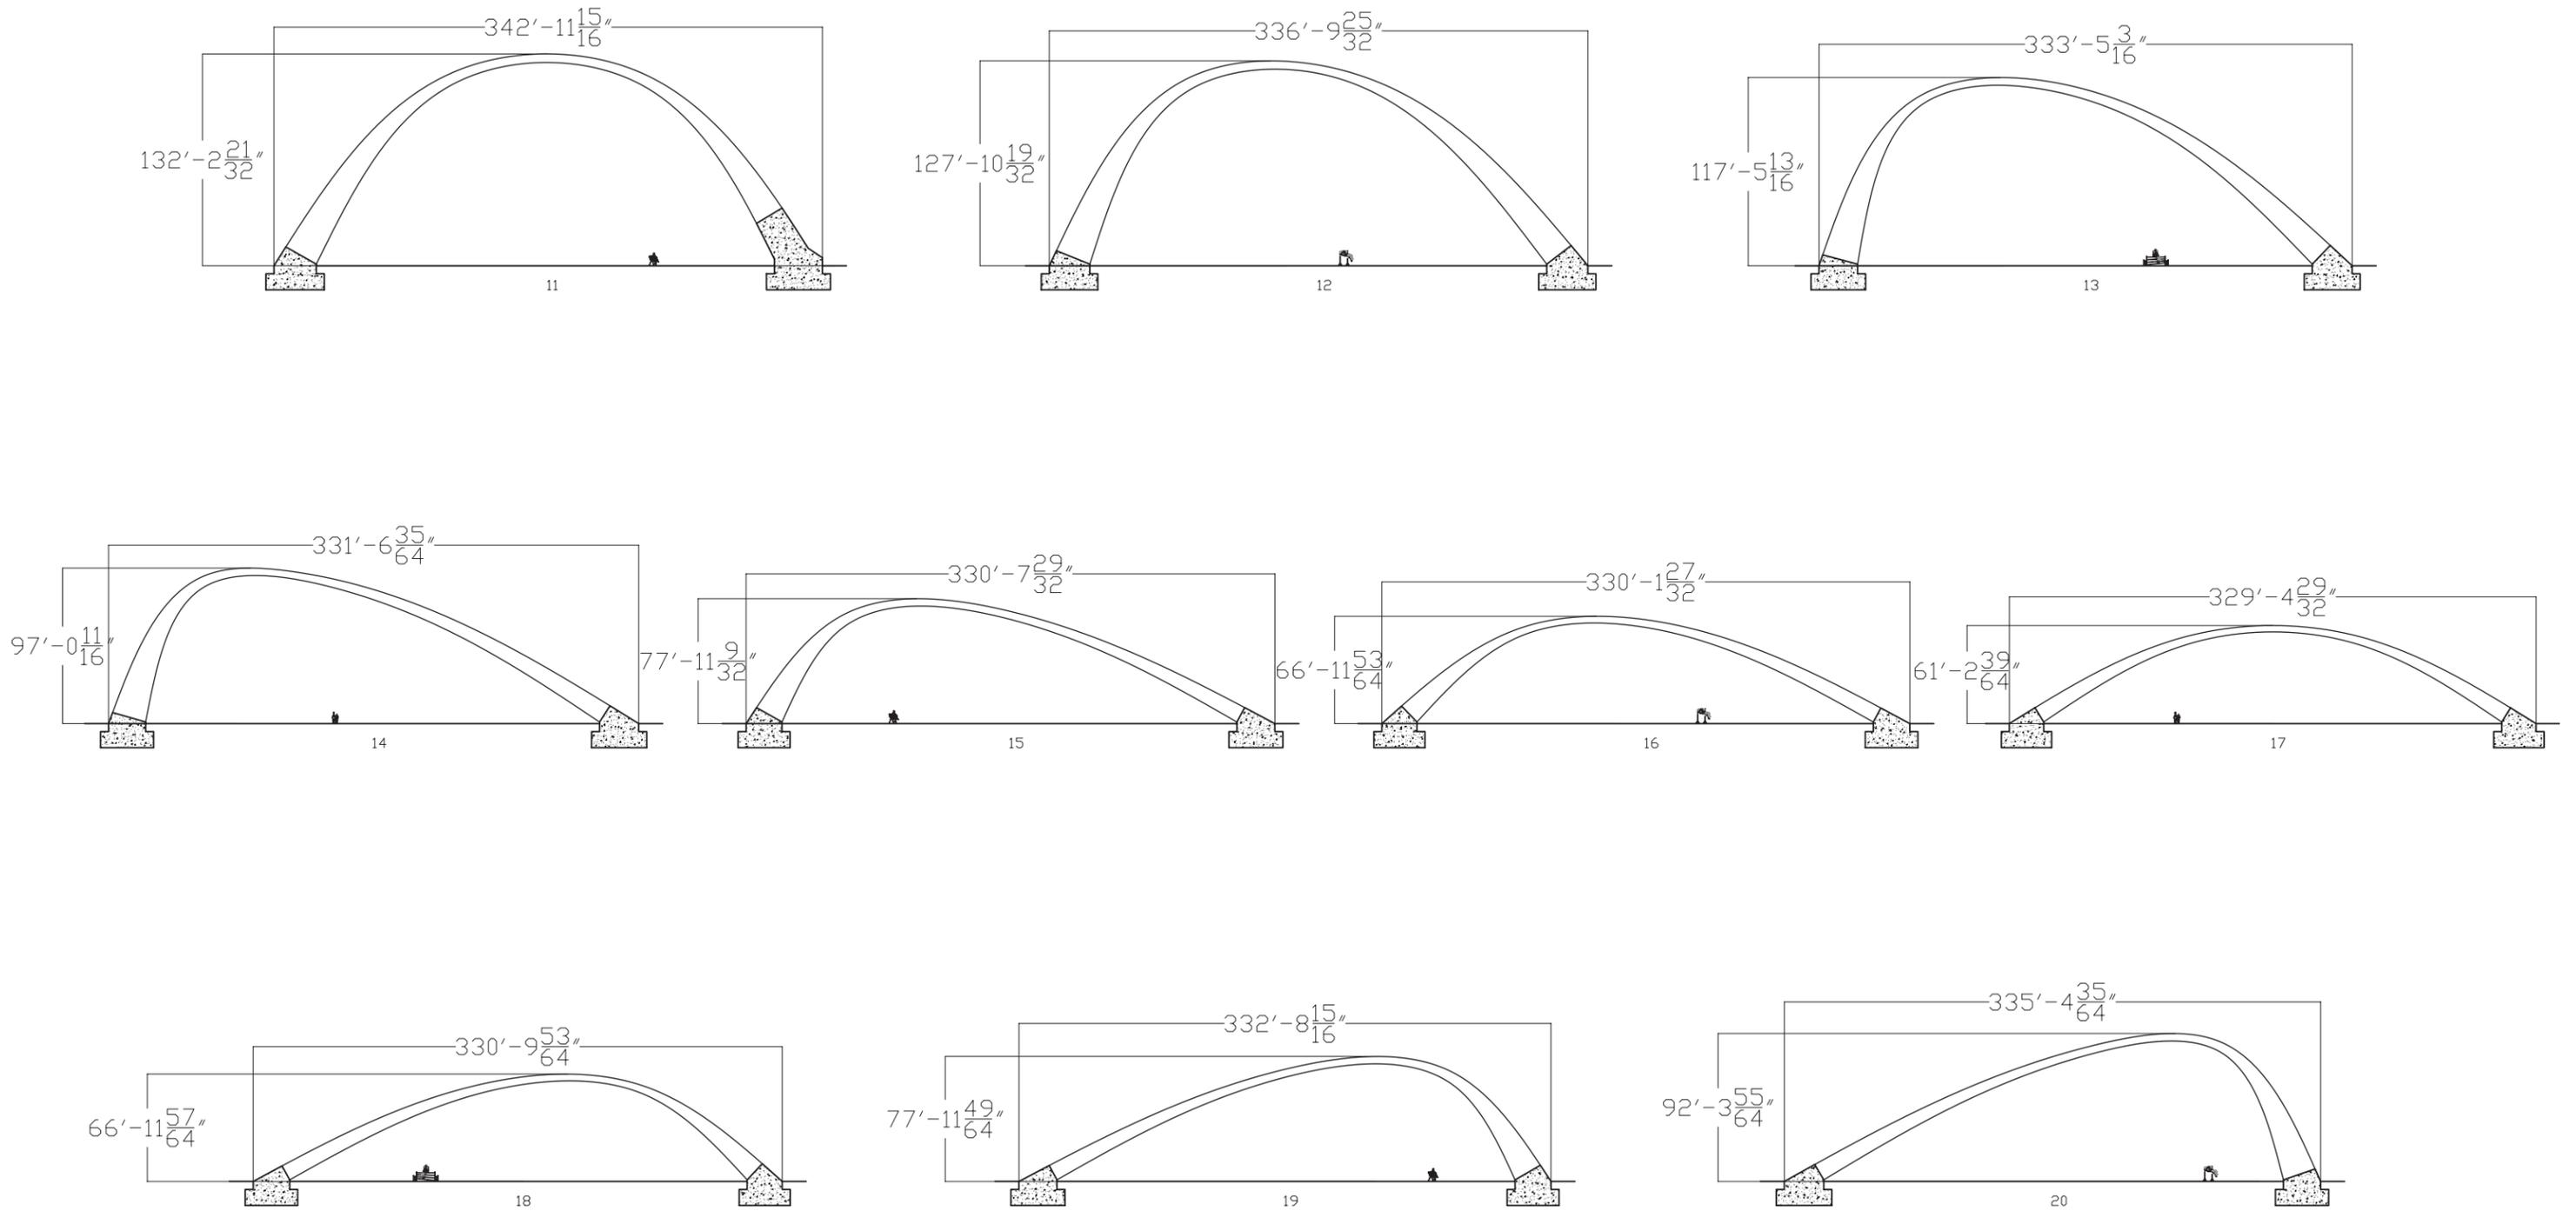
Elevations of Primary Arches (Arches 11-20)
